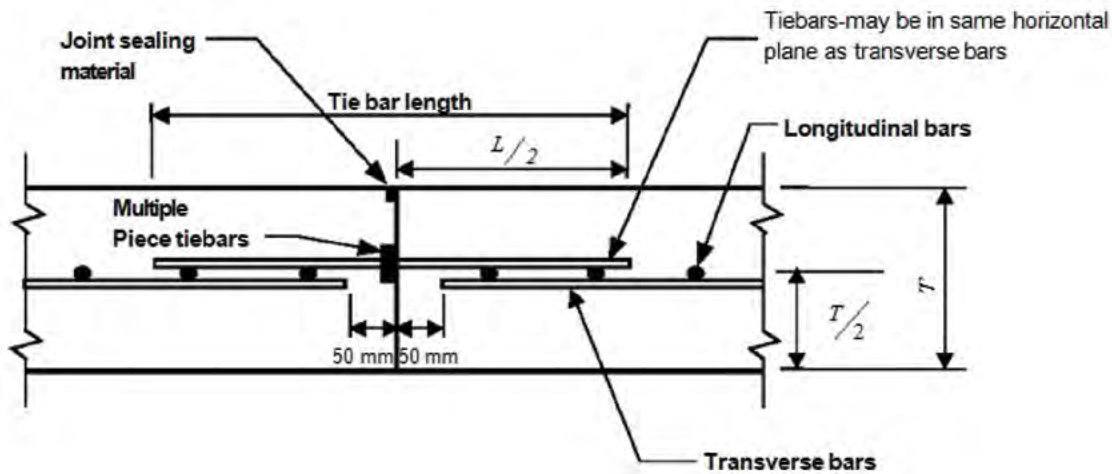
Longitudinal construction joint tied with two-piece tie bars.
